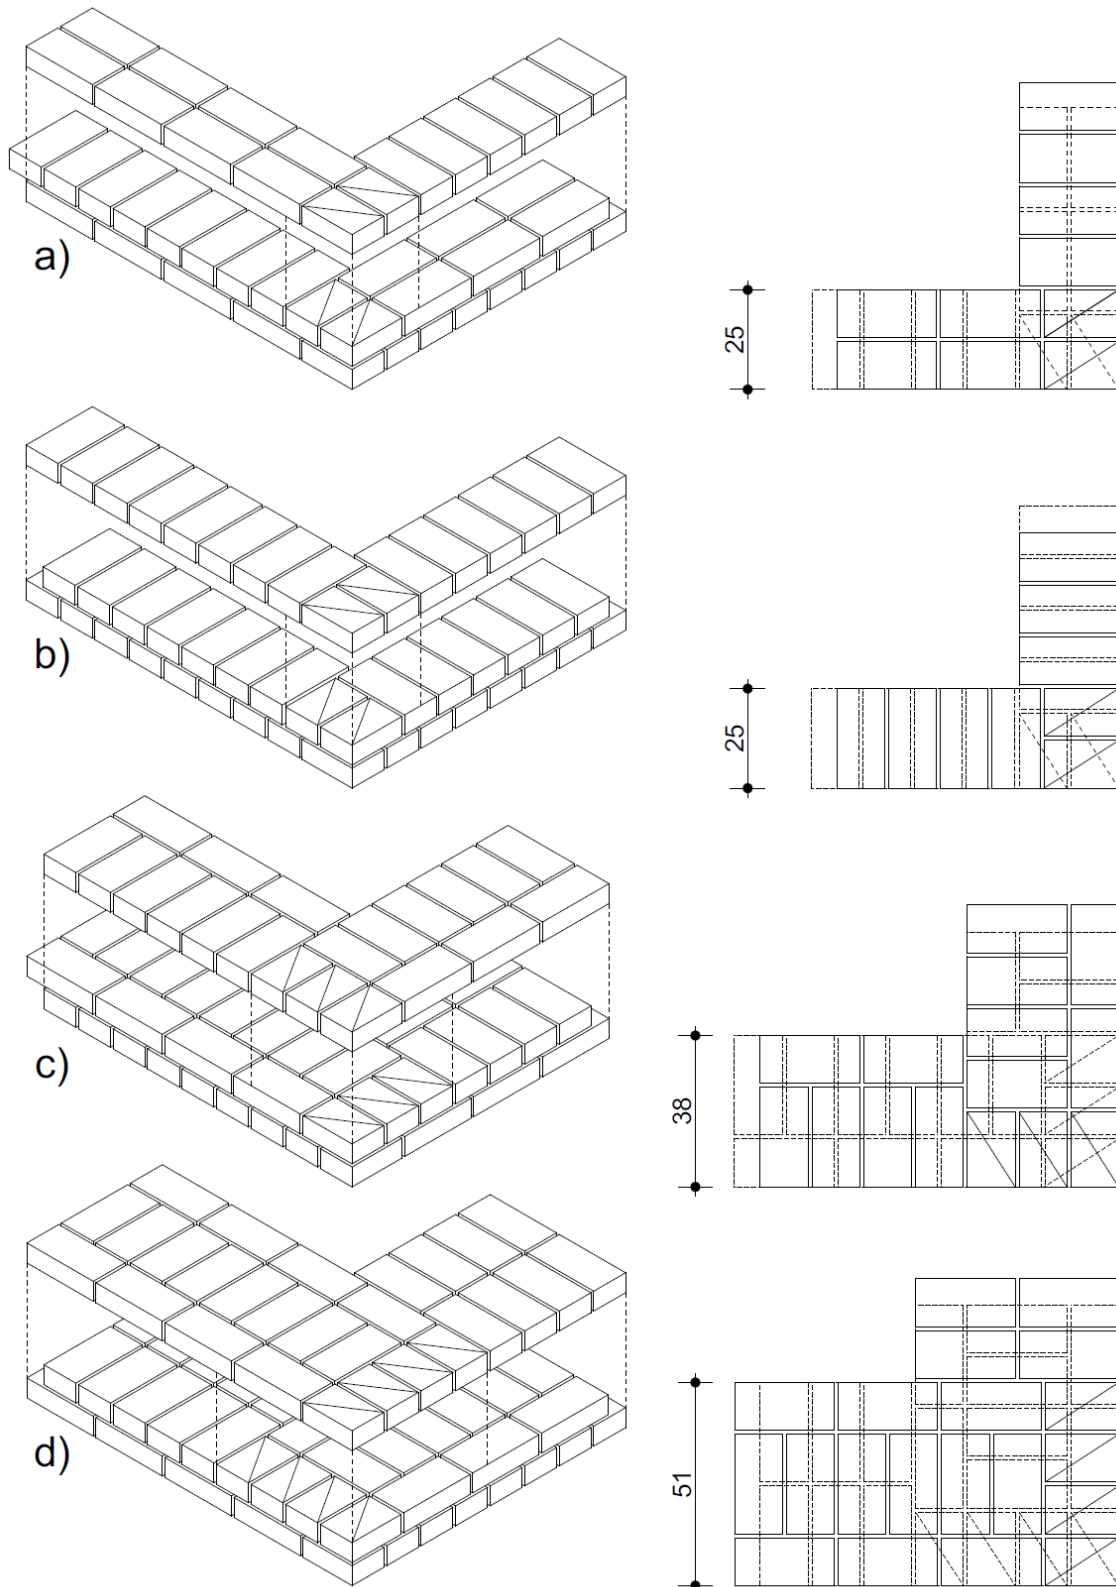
Wall corner: a)-b) one-brick wall heder and stretcher bond, c) english bond of half-and one-brick wall, d) english bond of two-brick wall
